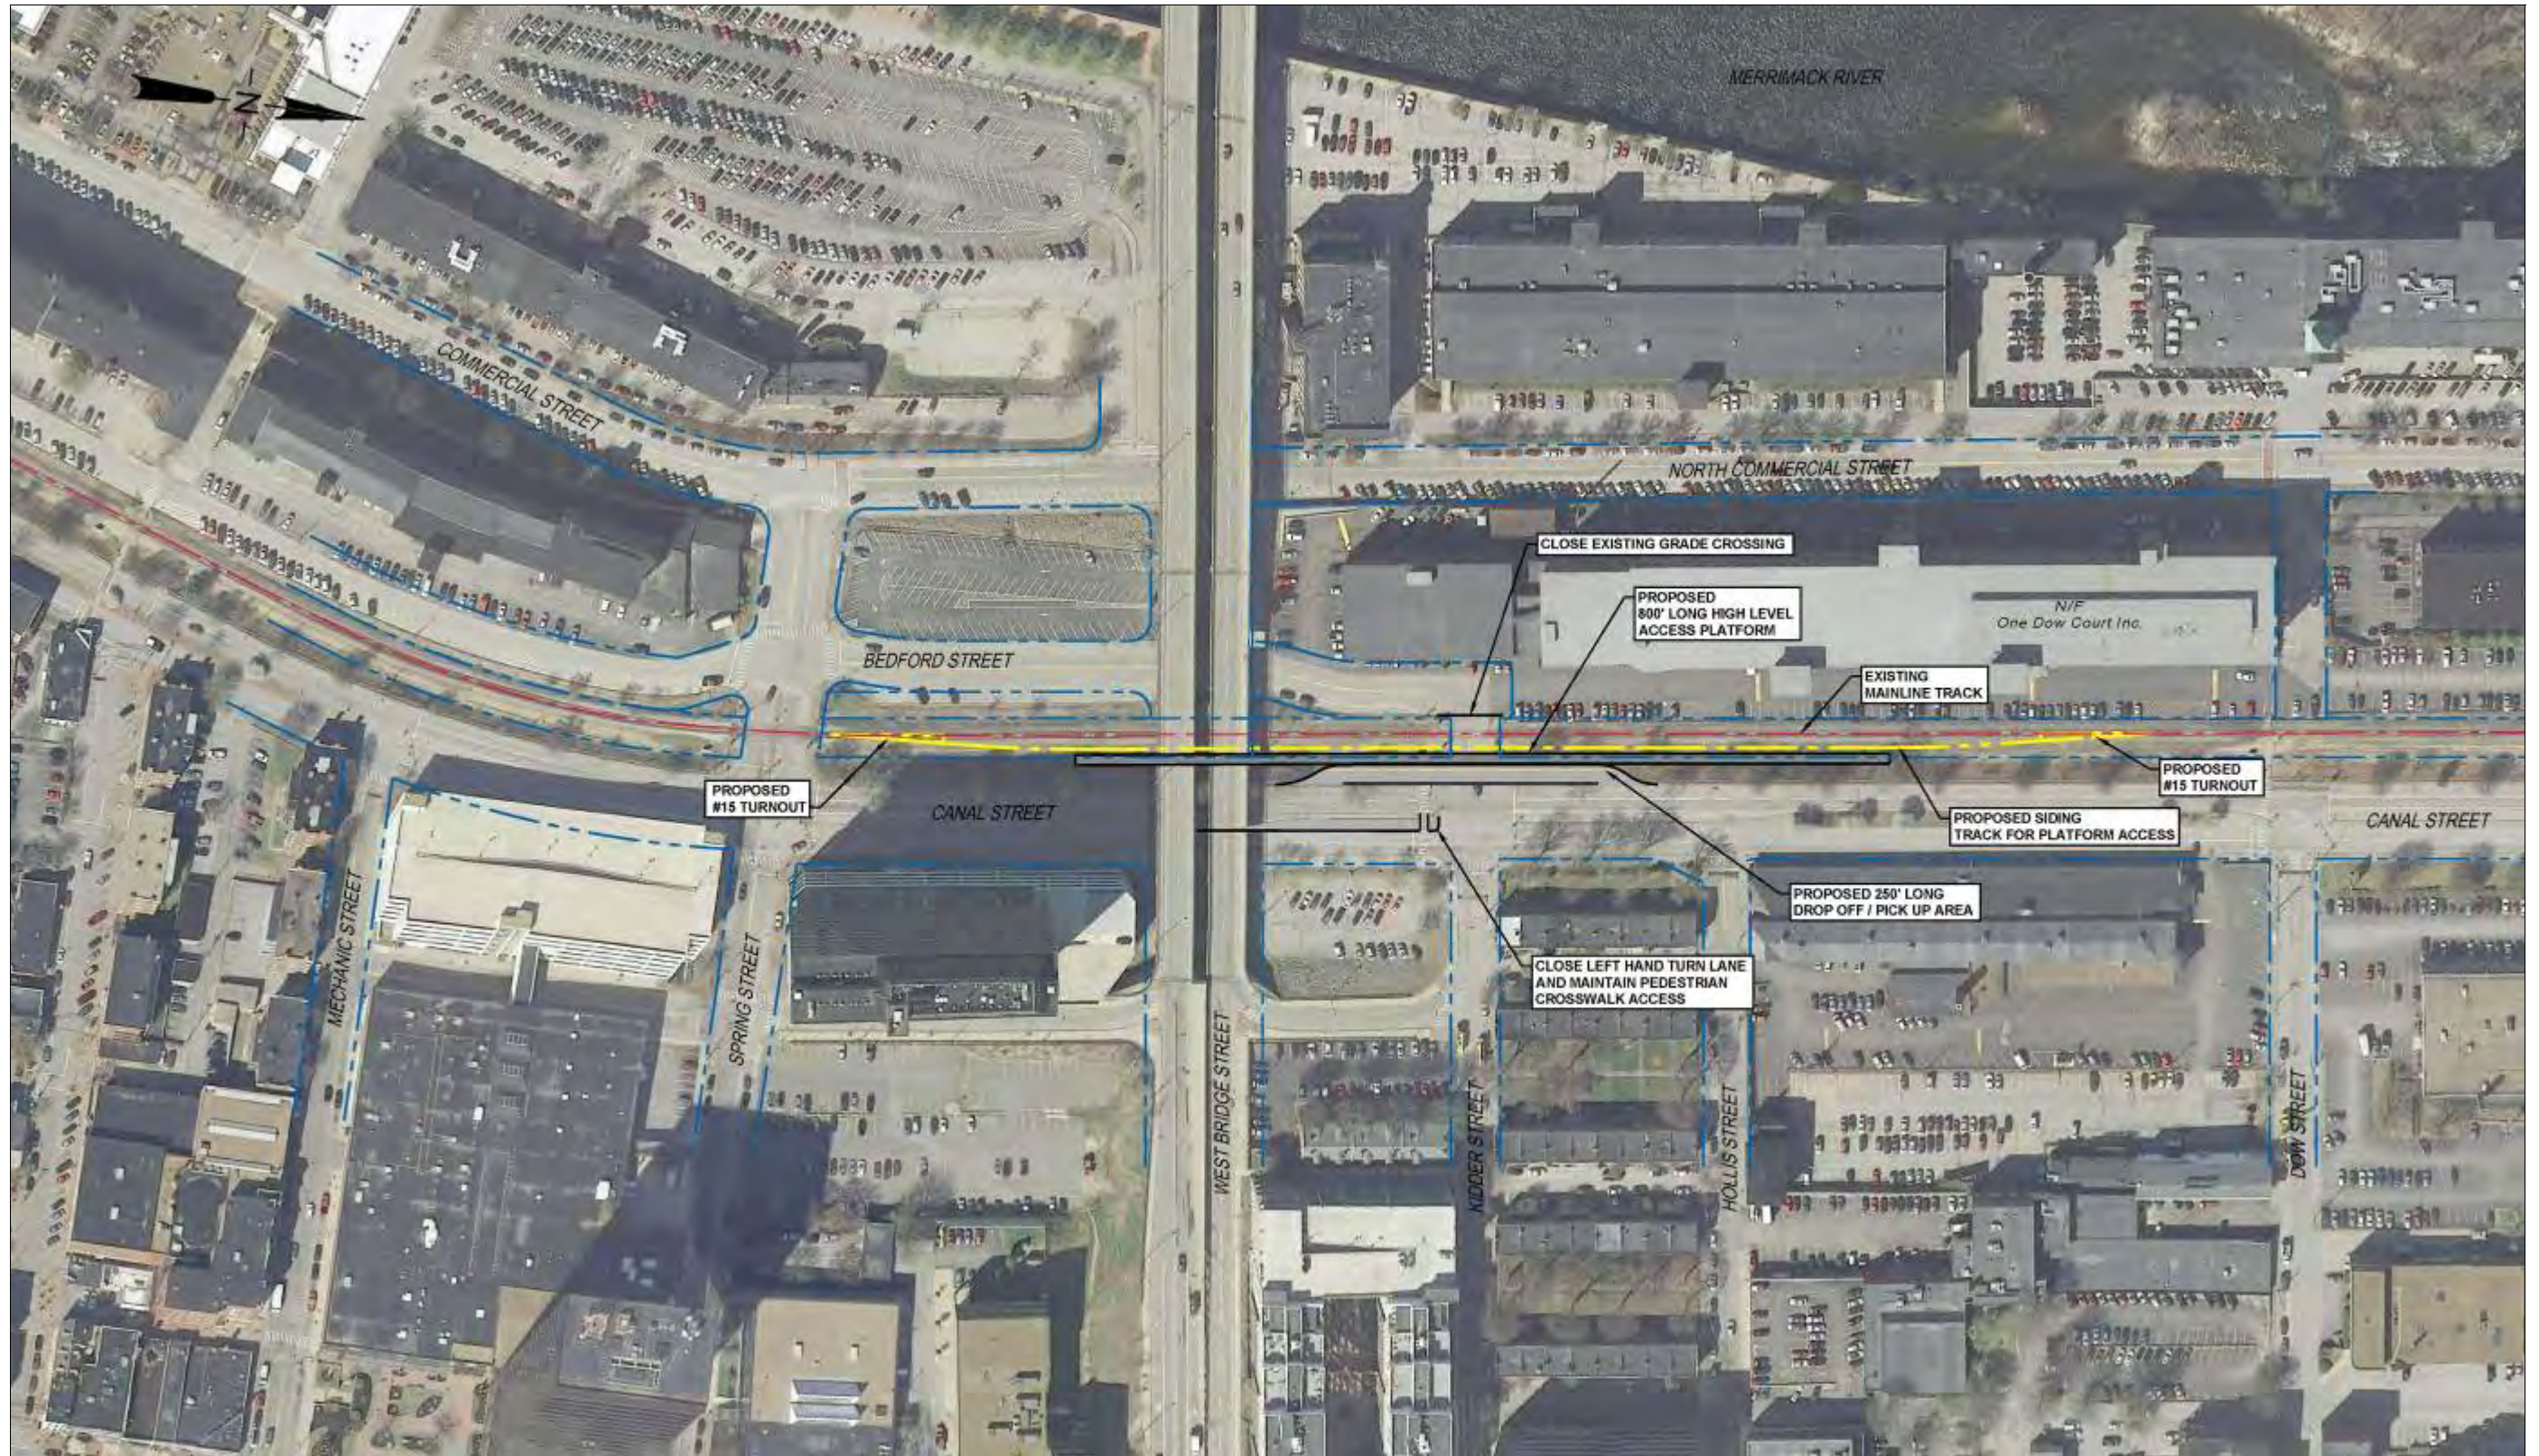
Plan drawing of the proposed Spring Street Station platform.
